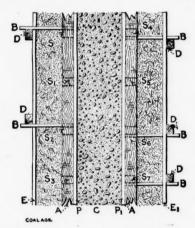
Plan View of Wall with Concrete and Manure in Place
